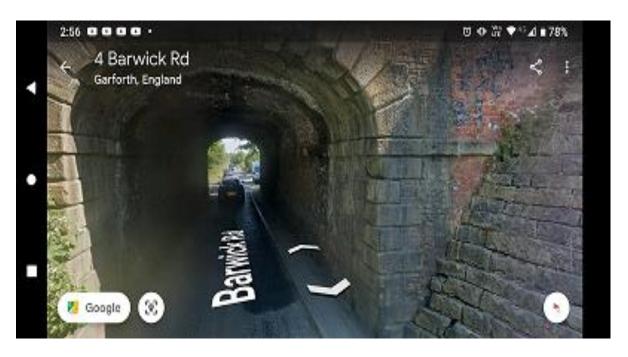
similar view to photo G4, but a screenshot from Google Earth in late 2023
